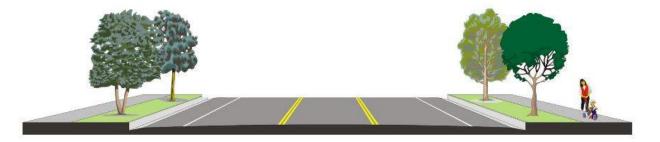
Typical Cross-Sections – Collectors & Local Roads
